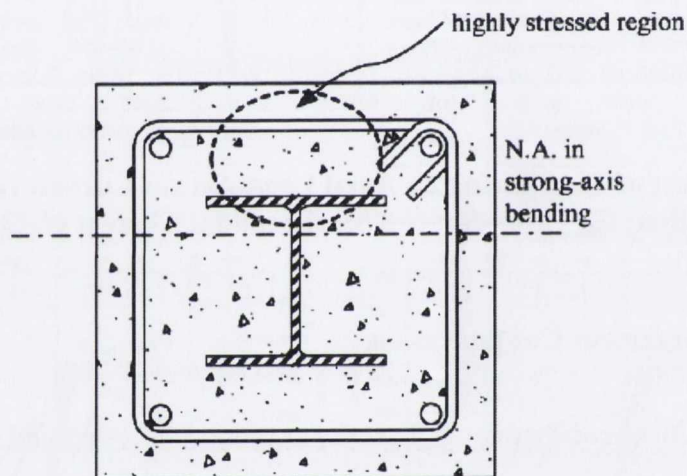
Typical Fully-Encased Composite Column Cross Section
